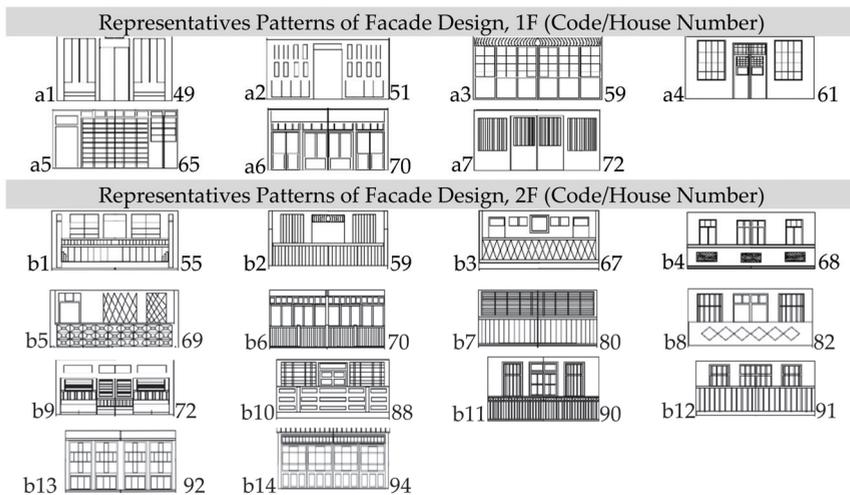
Main design styles of the building facade on Shennong Street. (Adapted from [18]).
